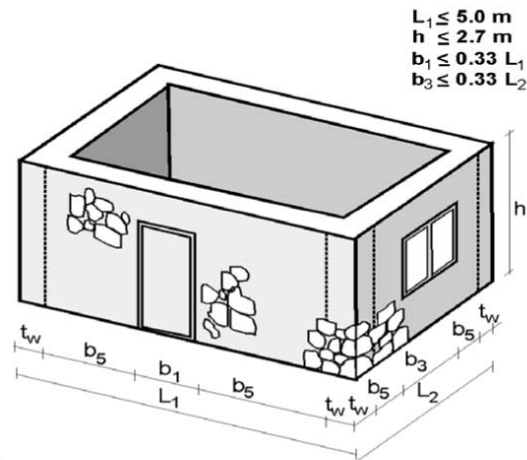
Control on length, height and openings in stone walls built in mud mortar.
